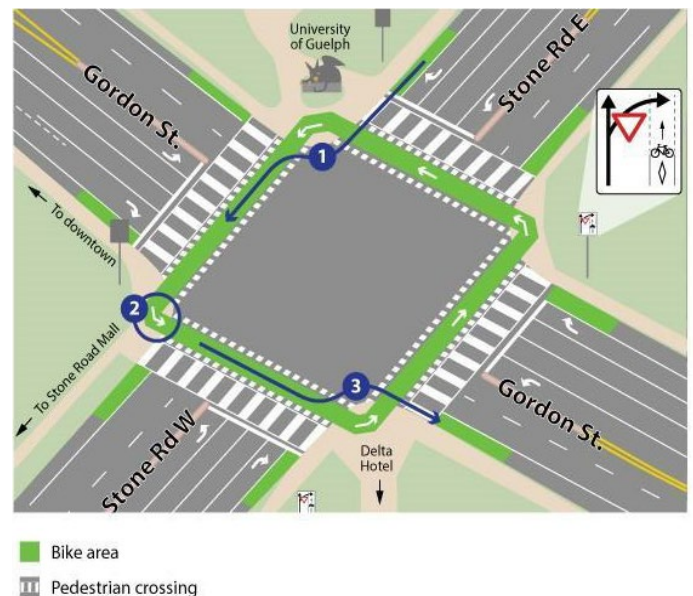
Dedicated intersection at Gordon Street and Stone Road
